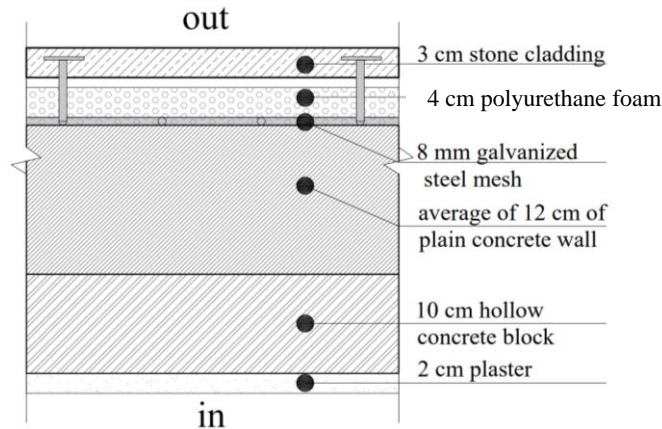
Trial 13, outer installation of PU foam on concrete wall composite
